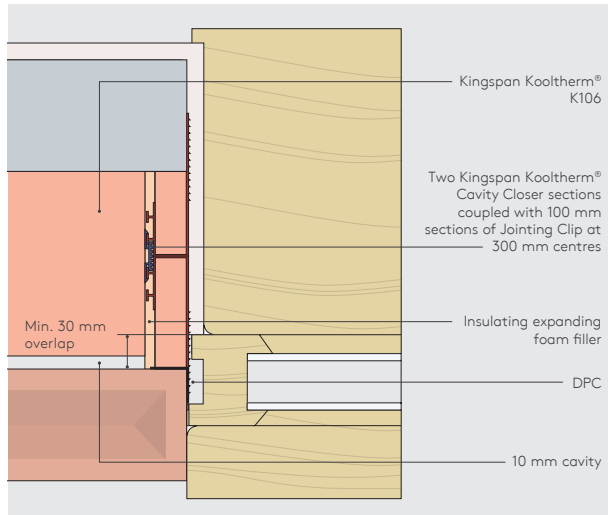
Jamb Detail Incorporating Two Kingspan Kooltherm® Cavity Closer Sections Coupled 'Back-to-Back' with a Jointing Clip
